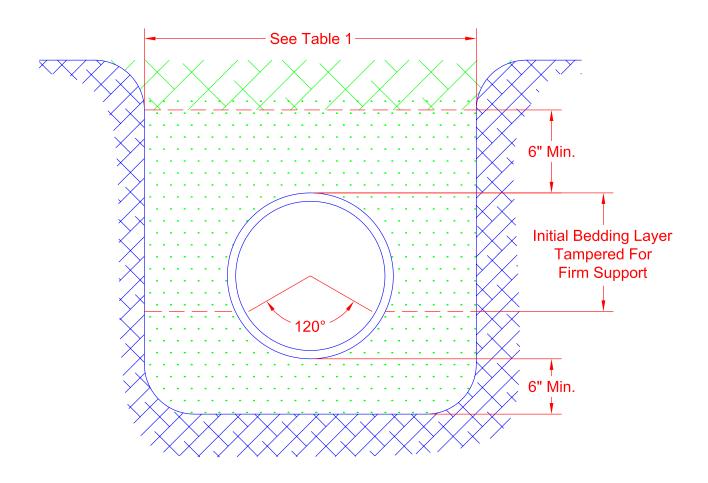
Standard Conditions – Firm or Hard Soils Typical Class "B" Bedding. NOTE: Area must conform to and firmly support pipe. Hand shaping or packing may be used.
